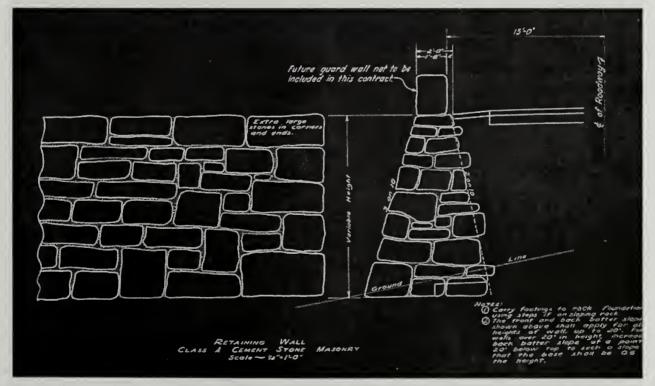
Detail of a guardwall/retaining wall from Otter Cove Causeway and Blackwoods Road, 1937. (U.S. Department of Agriculture, Bureau of Public Roads, Project 7A1, Sheet 18 of 79, 1937)
